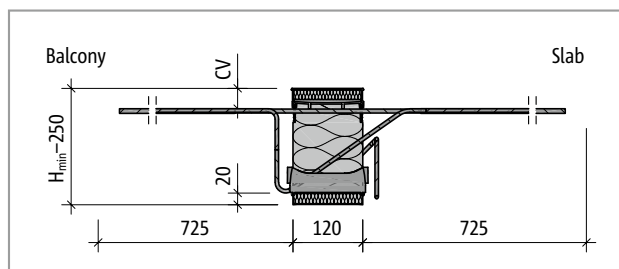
Schöck Isokorb® XT type K-M8: Product plan view
